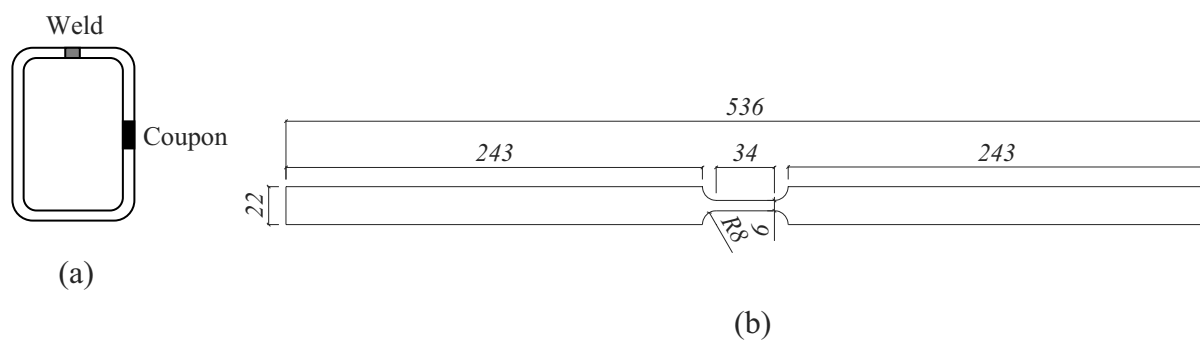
(a) Location of coupon and weld in hollow section (b) Dimensions of coupon specimens
